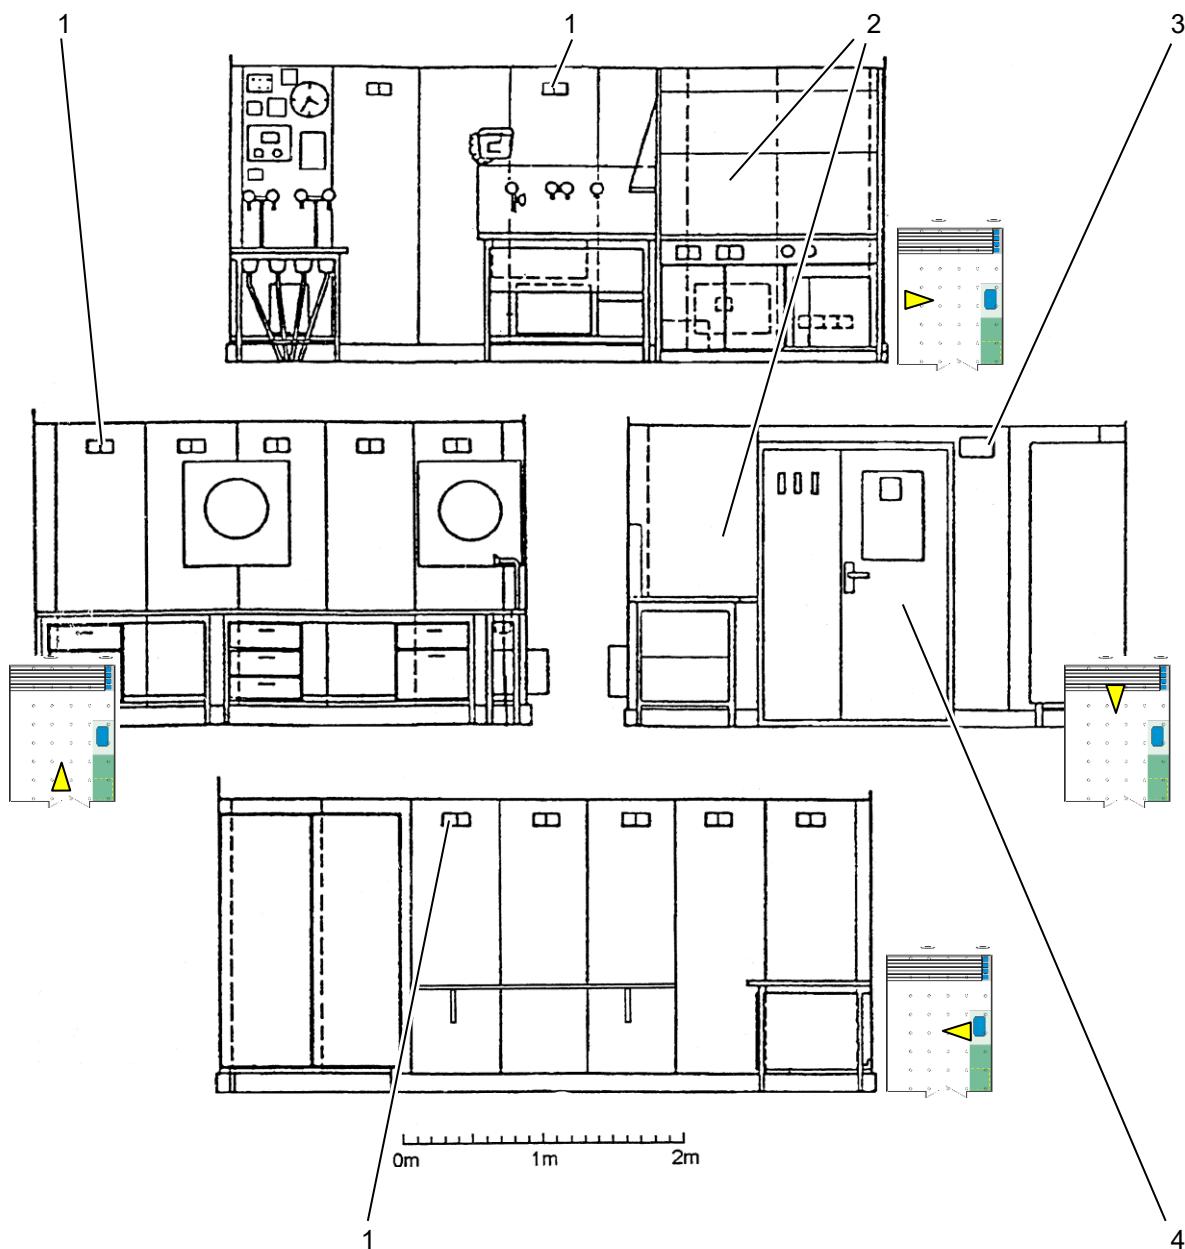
Bio-chemistry laboratory 6 (detailed plan laboratory walls, status 1986)
